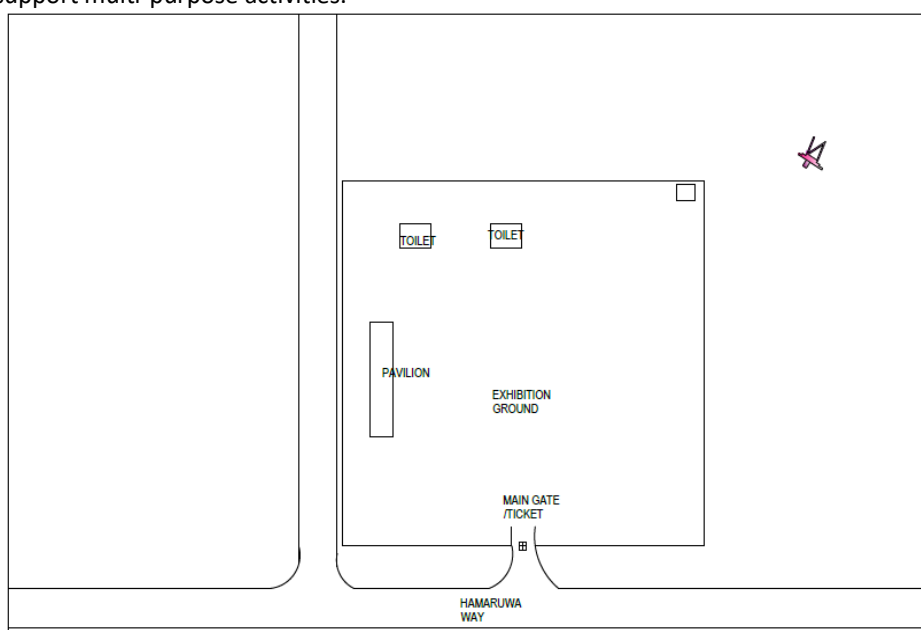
Floor Plan of the Existing Jalingo Trade Fair Complex
